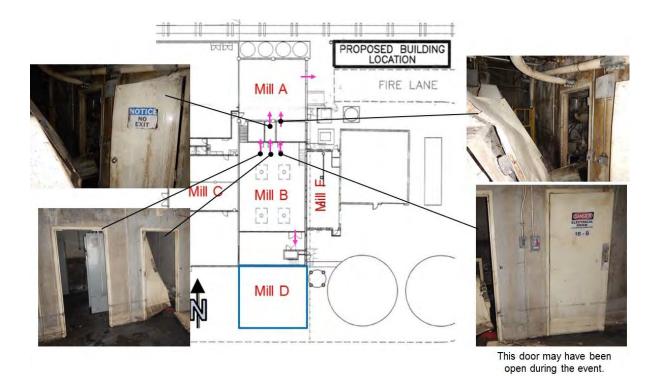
Mill A and Mill B Level 1 Exemplar Directional Indicators
